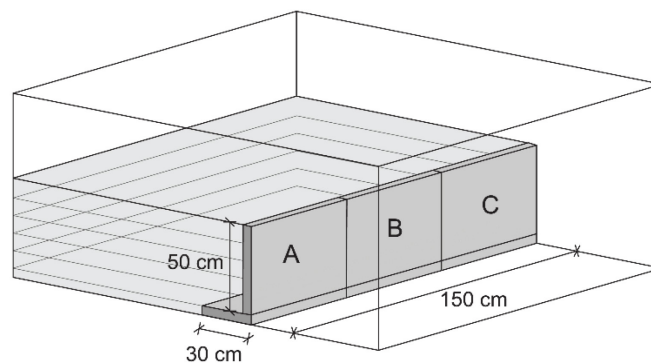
Isometric view of the test setup. The cantilever wall (Section 5.1.1) is placed in a glass box and backfilled. The three wall sections are named “A”, “B”, and “C”.
